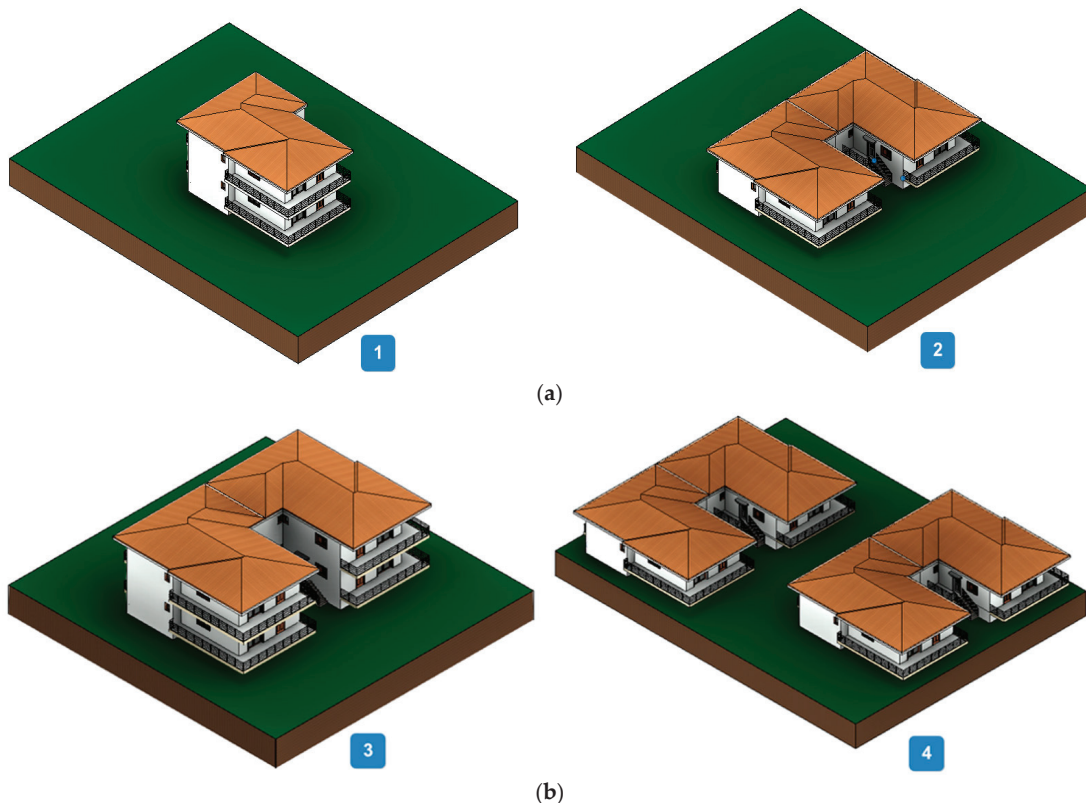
(a) Digital 3D/BIM model of type A buildings with one or two floors. (b) Digital 3D/BIM model of type B buildings with one or two floors.
